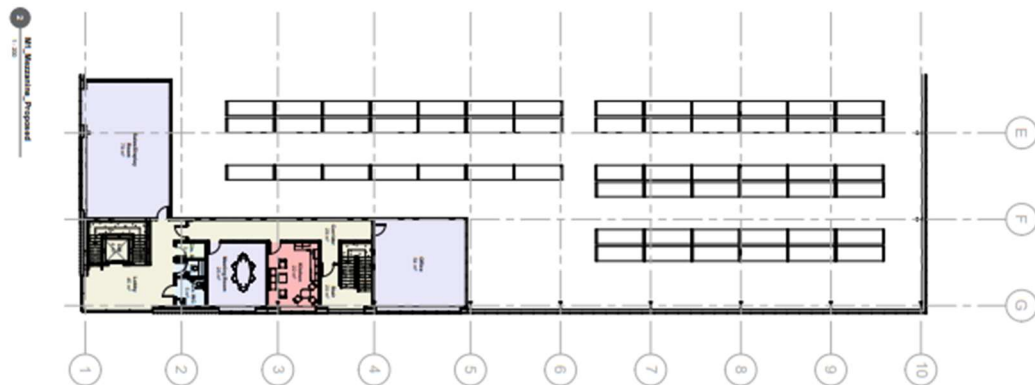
Proposed Mezzanine Floor Plan [source: Cassidy + Ashton]
